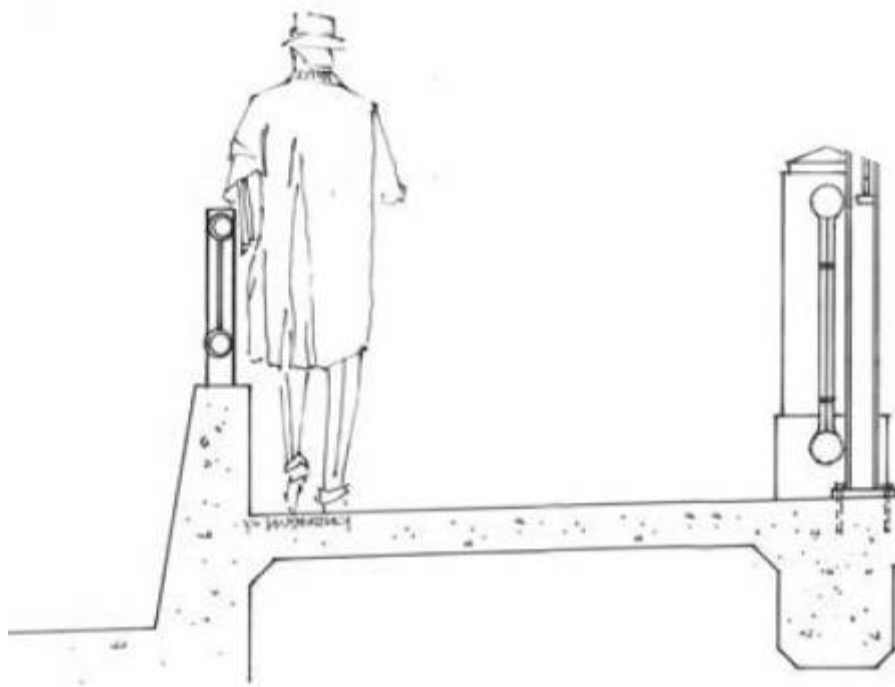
I-5 Crossing Sidewalk with Added Rail²⁸
